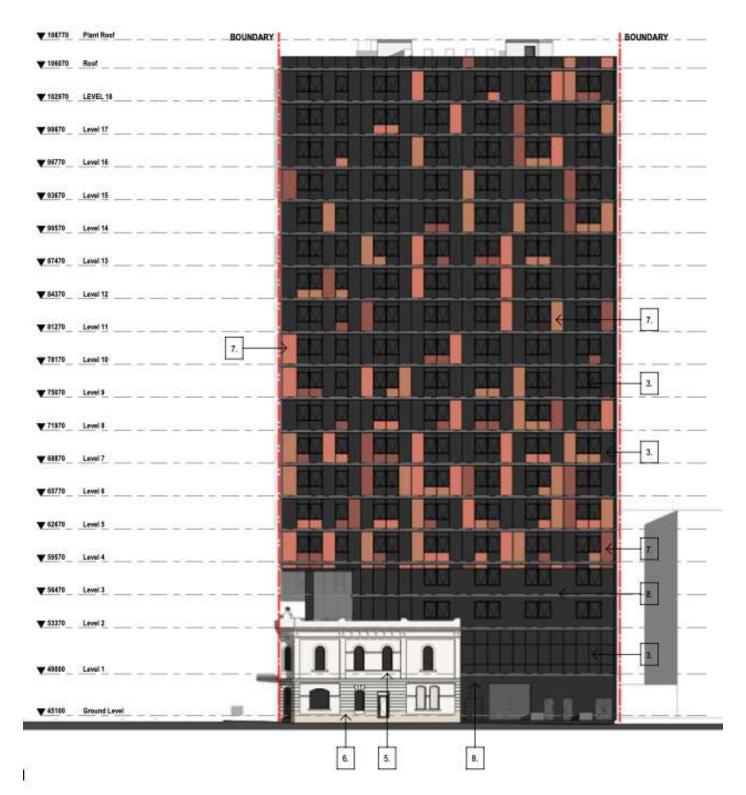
Extract from Brown Falconer drawings showing Union Street elevation.
